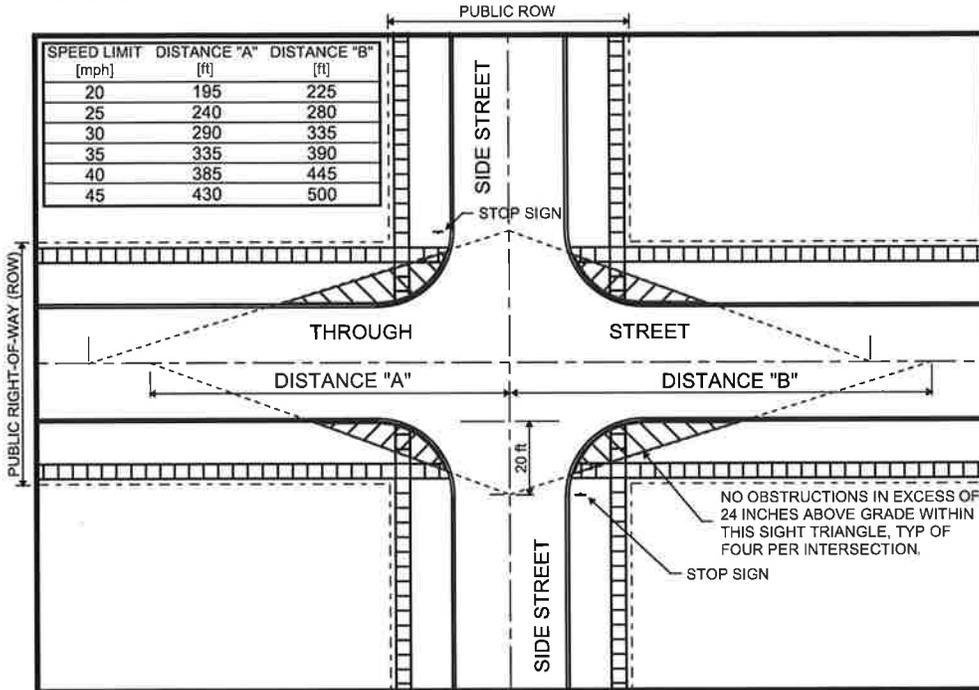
CASE 1: SIGHT TRIANGLE FOR STOP SIGN CONTROLLED INTERSECTION OF TWO STREETS.
